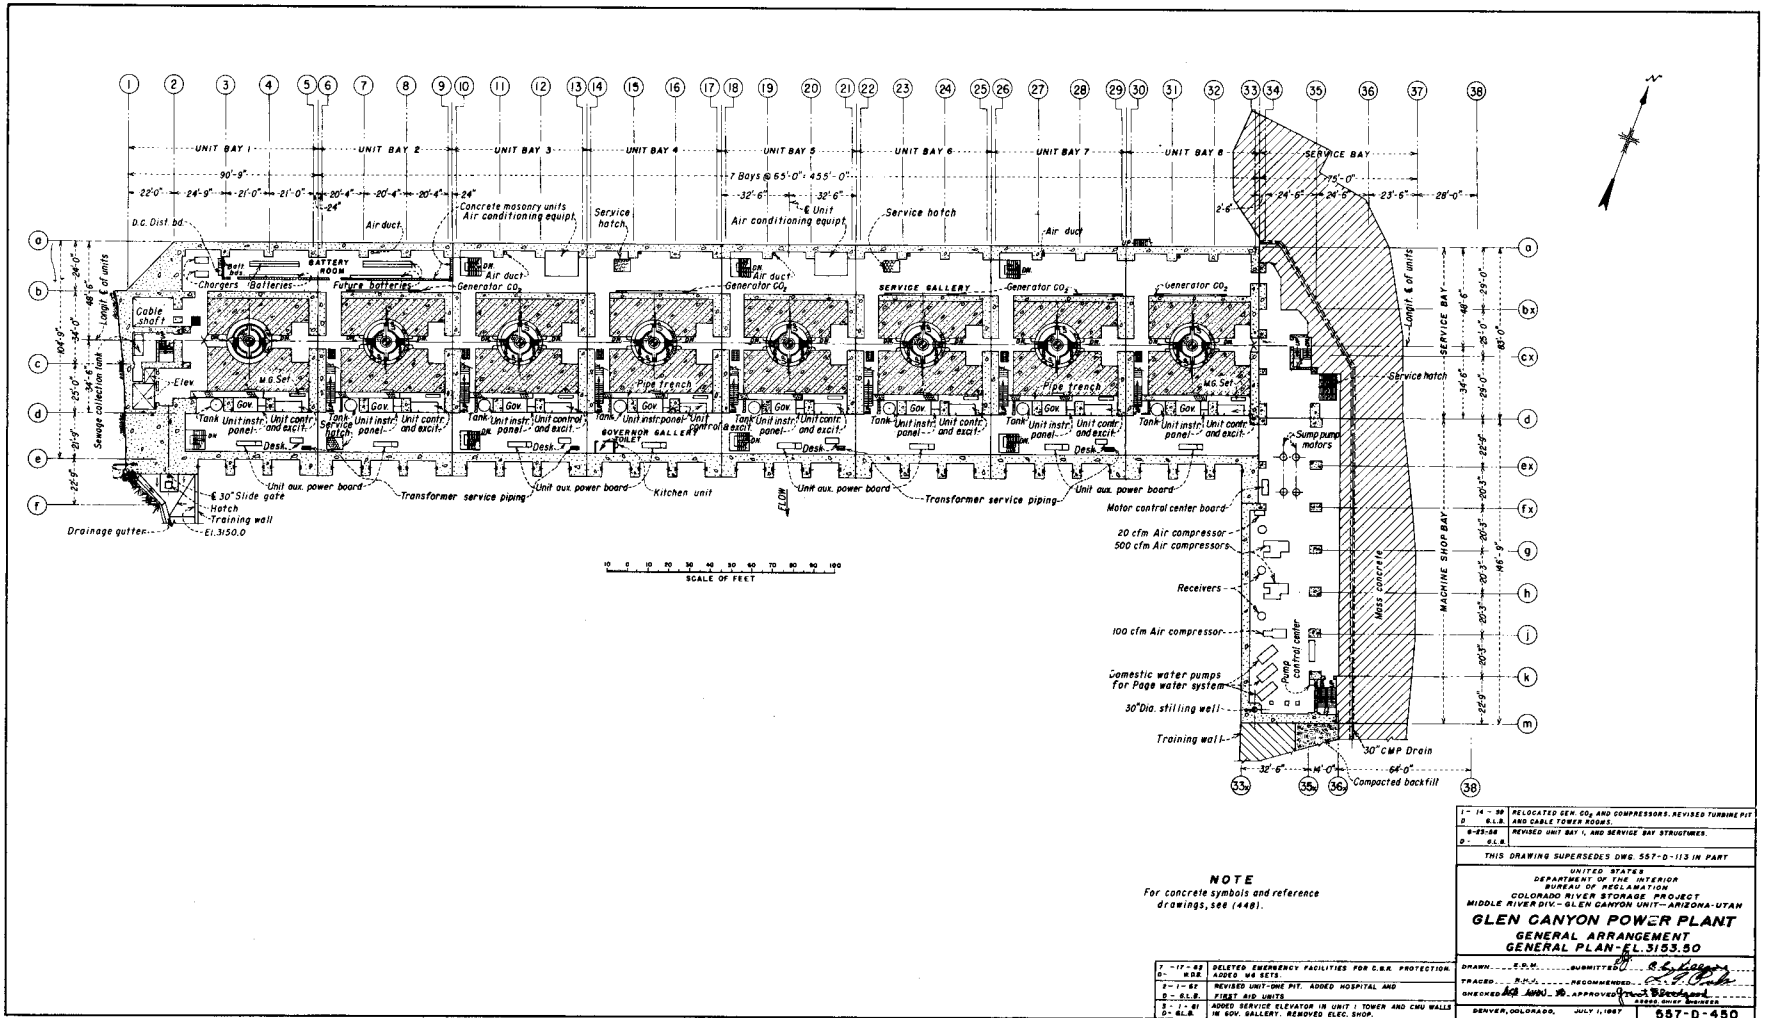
Powerplant general arrangement—Plan, elevation 3153.50.
